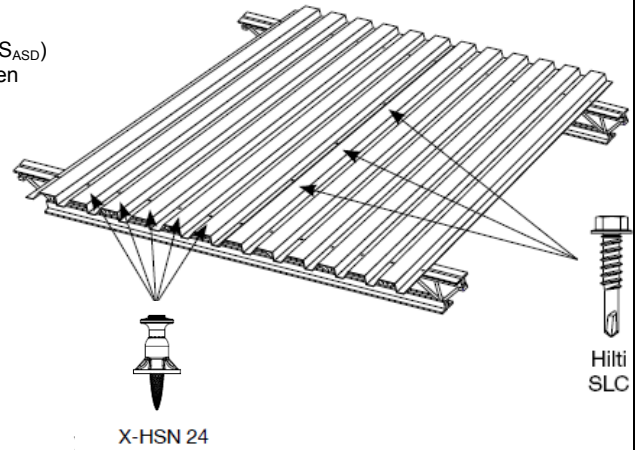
HILTI DECK FASTENER INSTALLATION OVERVIEW
